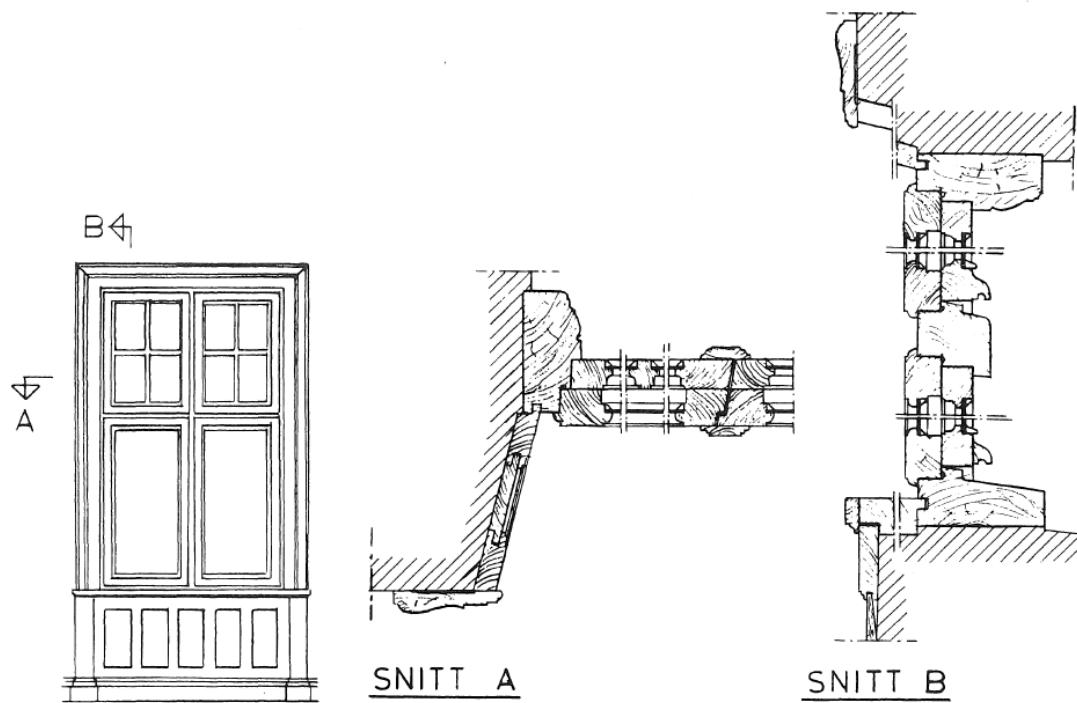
Window construction until 1910-1930 (Bjerking, 1974).
